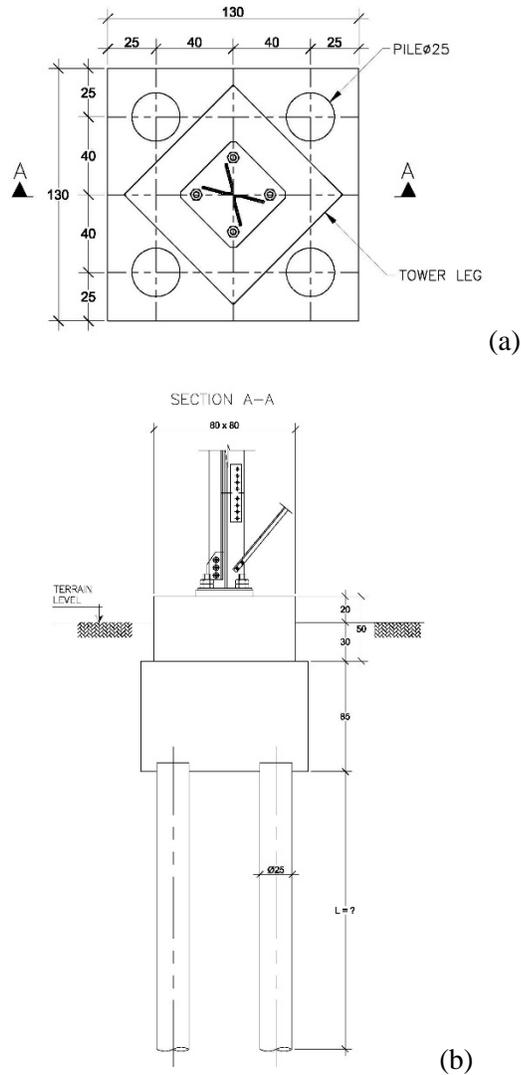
Foundation block detail: (a) plan view of a block, and (b) elevation of the block depicting two root-piles.
